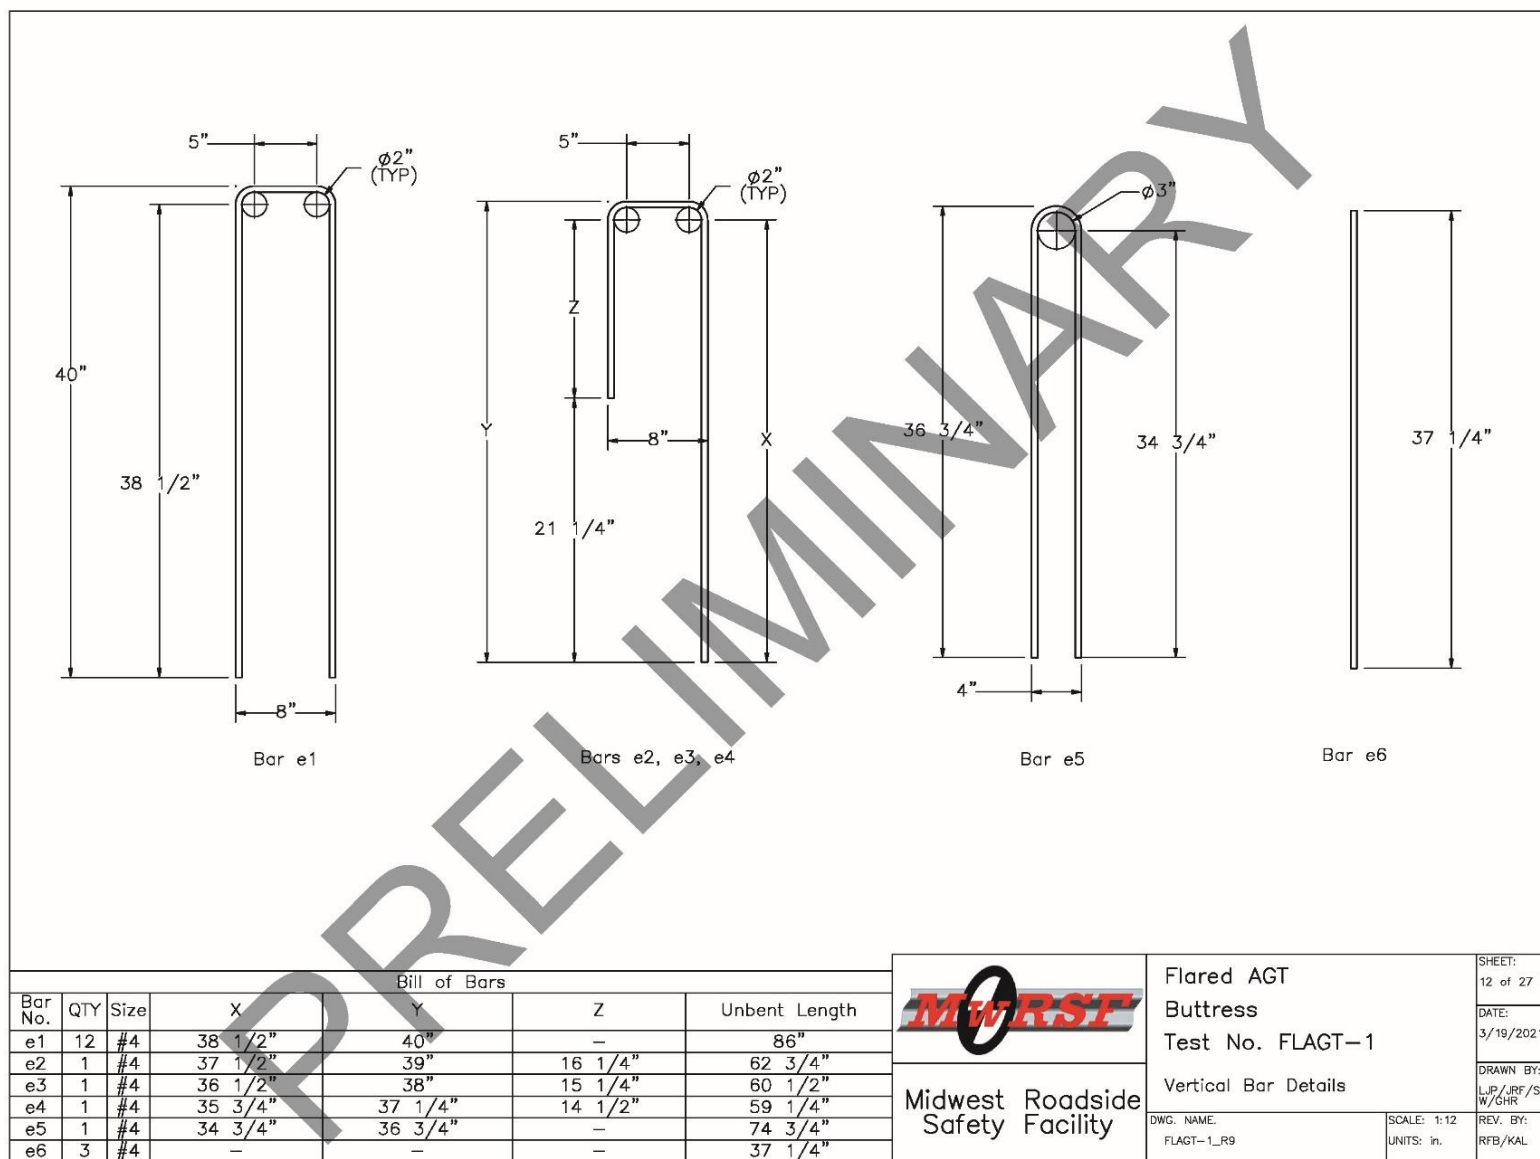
Vertical Rebar Details, Test No. FLAGT-1
